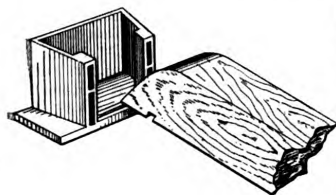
Method of Anchoring Horizontal Timbers to the Wall.
